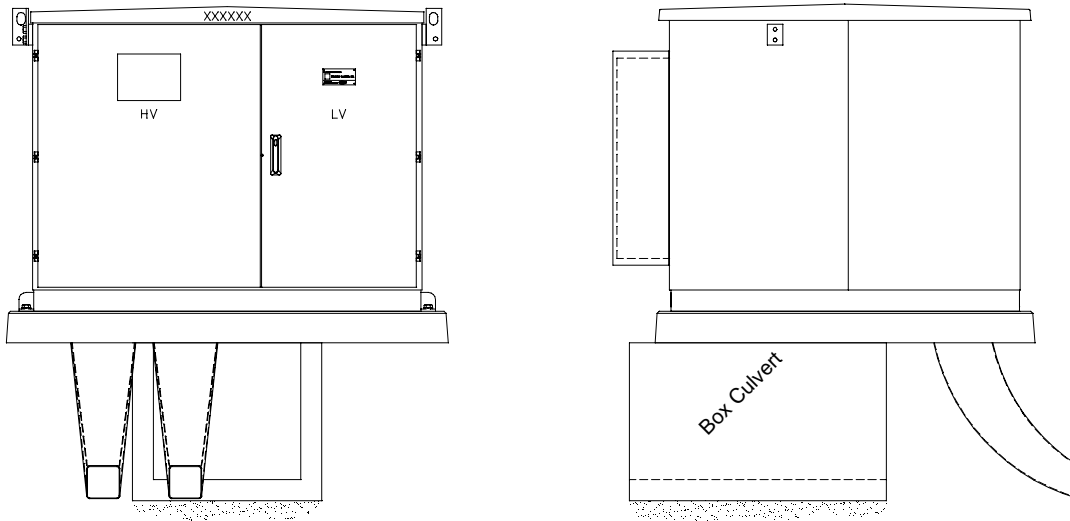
Box Culvert Foundation System (200 to 2000kVA)
